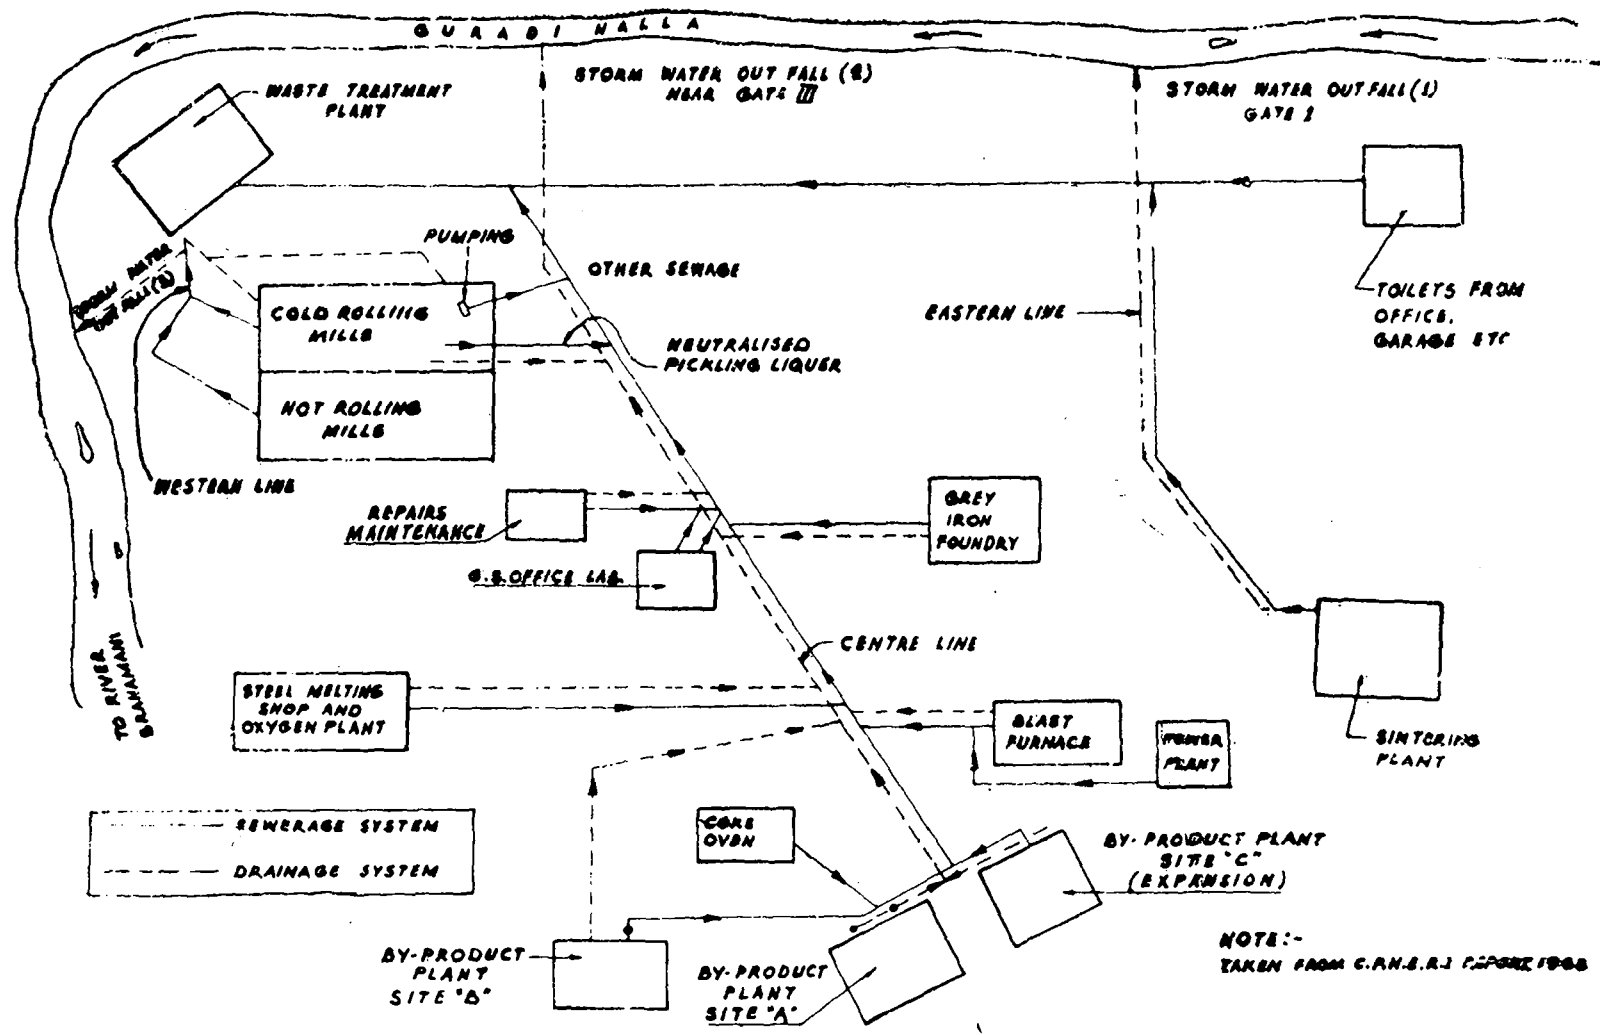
Sewerage and Drainage System of Rourkela Steel Plant (Schematic)
